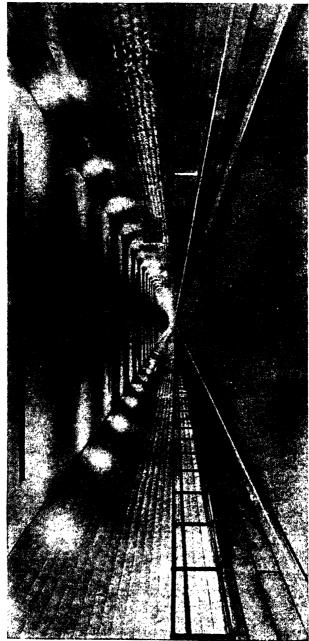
The walls of the International Tunnel between Detroit and Windsor, Ont., are covered with porcelain-enameled steel tile.
